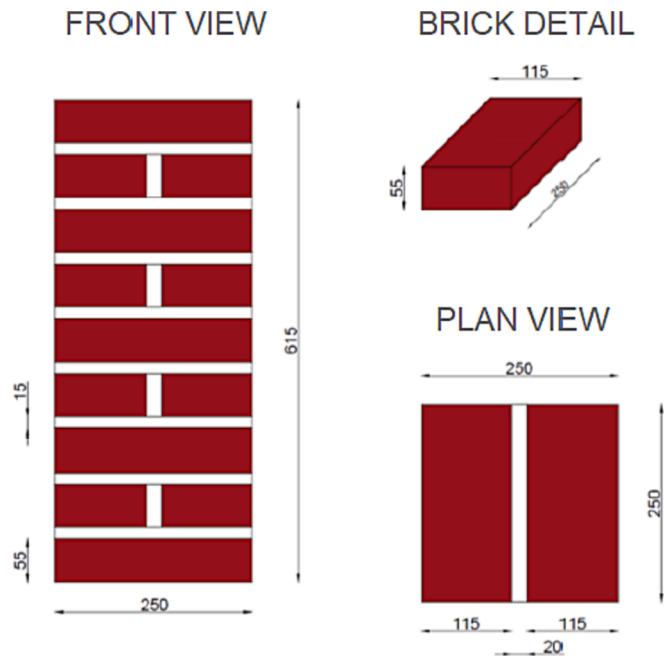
Specimens geometry and bricks layout. Dimensions in (mm).
